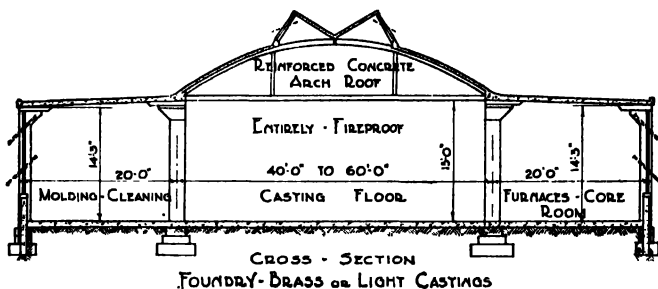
Foundries of combination flat slab and arch roof construction.
